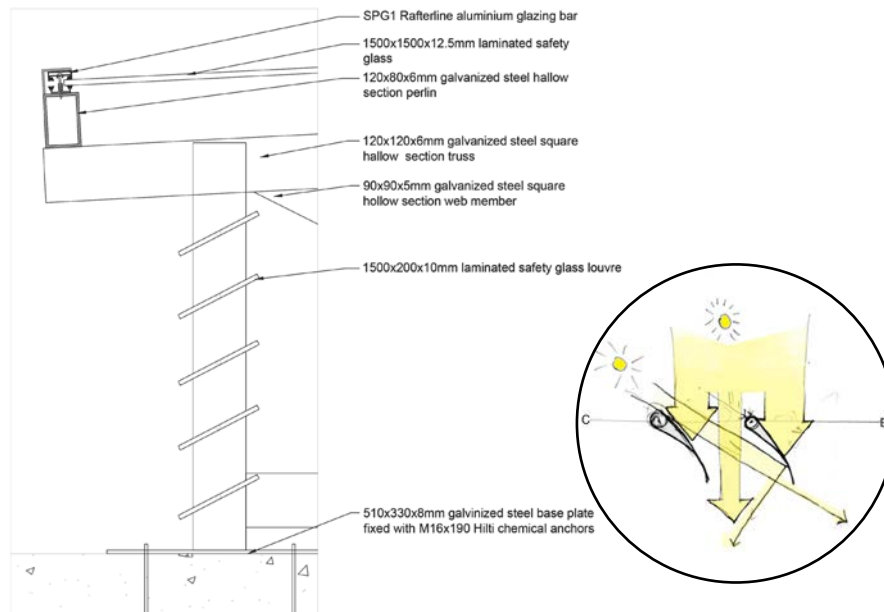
Roof structure and curved louvre design on top of the roof: Light obstructed by the louvre is still reflected in to maximise the light but is diffused by the under-side surface of the louvres (Author 2016)
